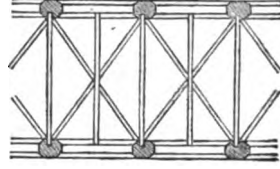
Plan of roof trusses in church, Bhagalpur.
